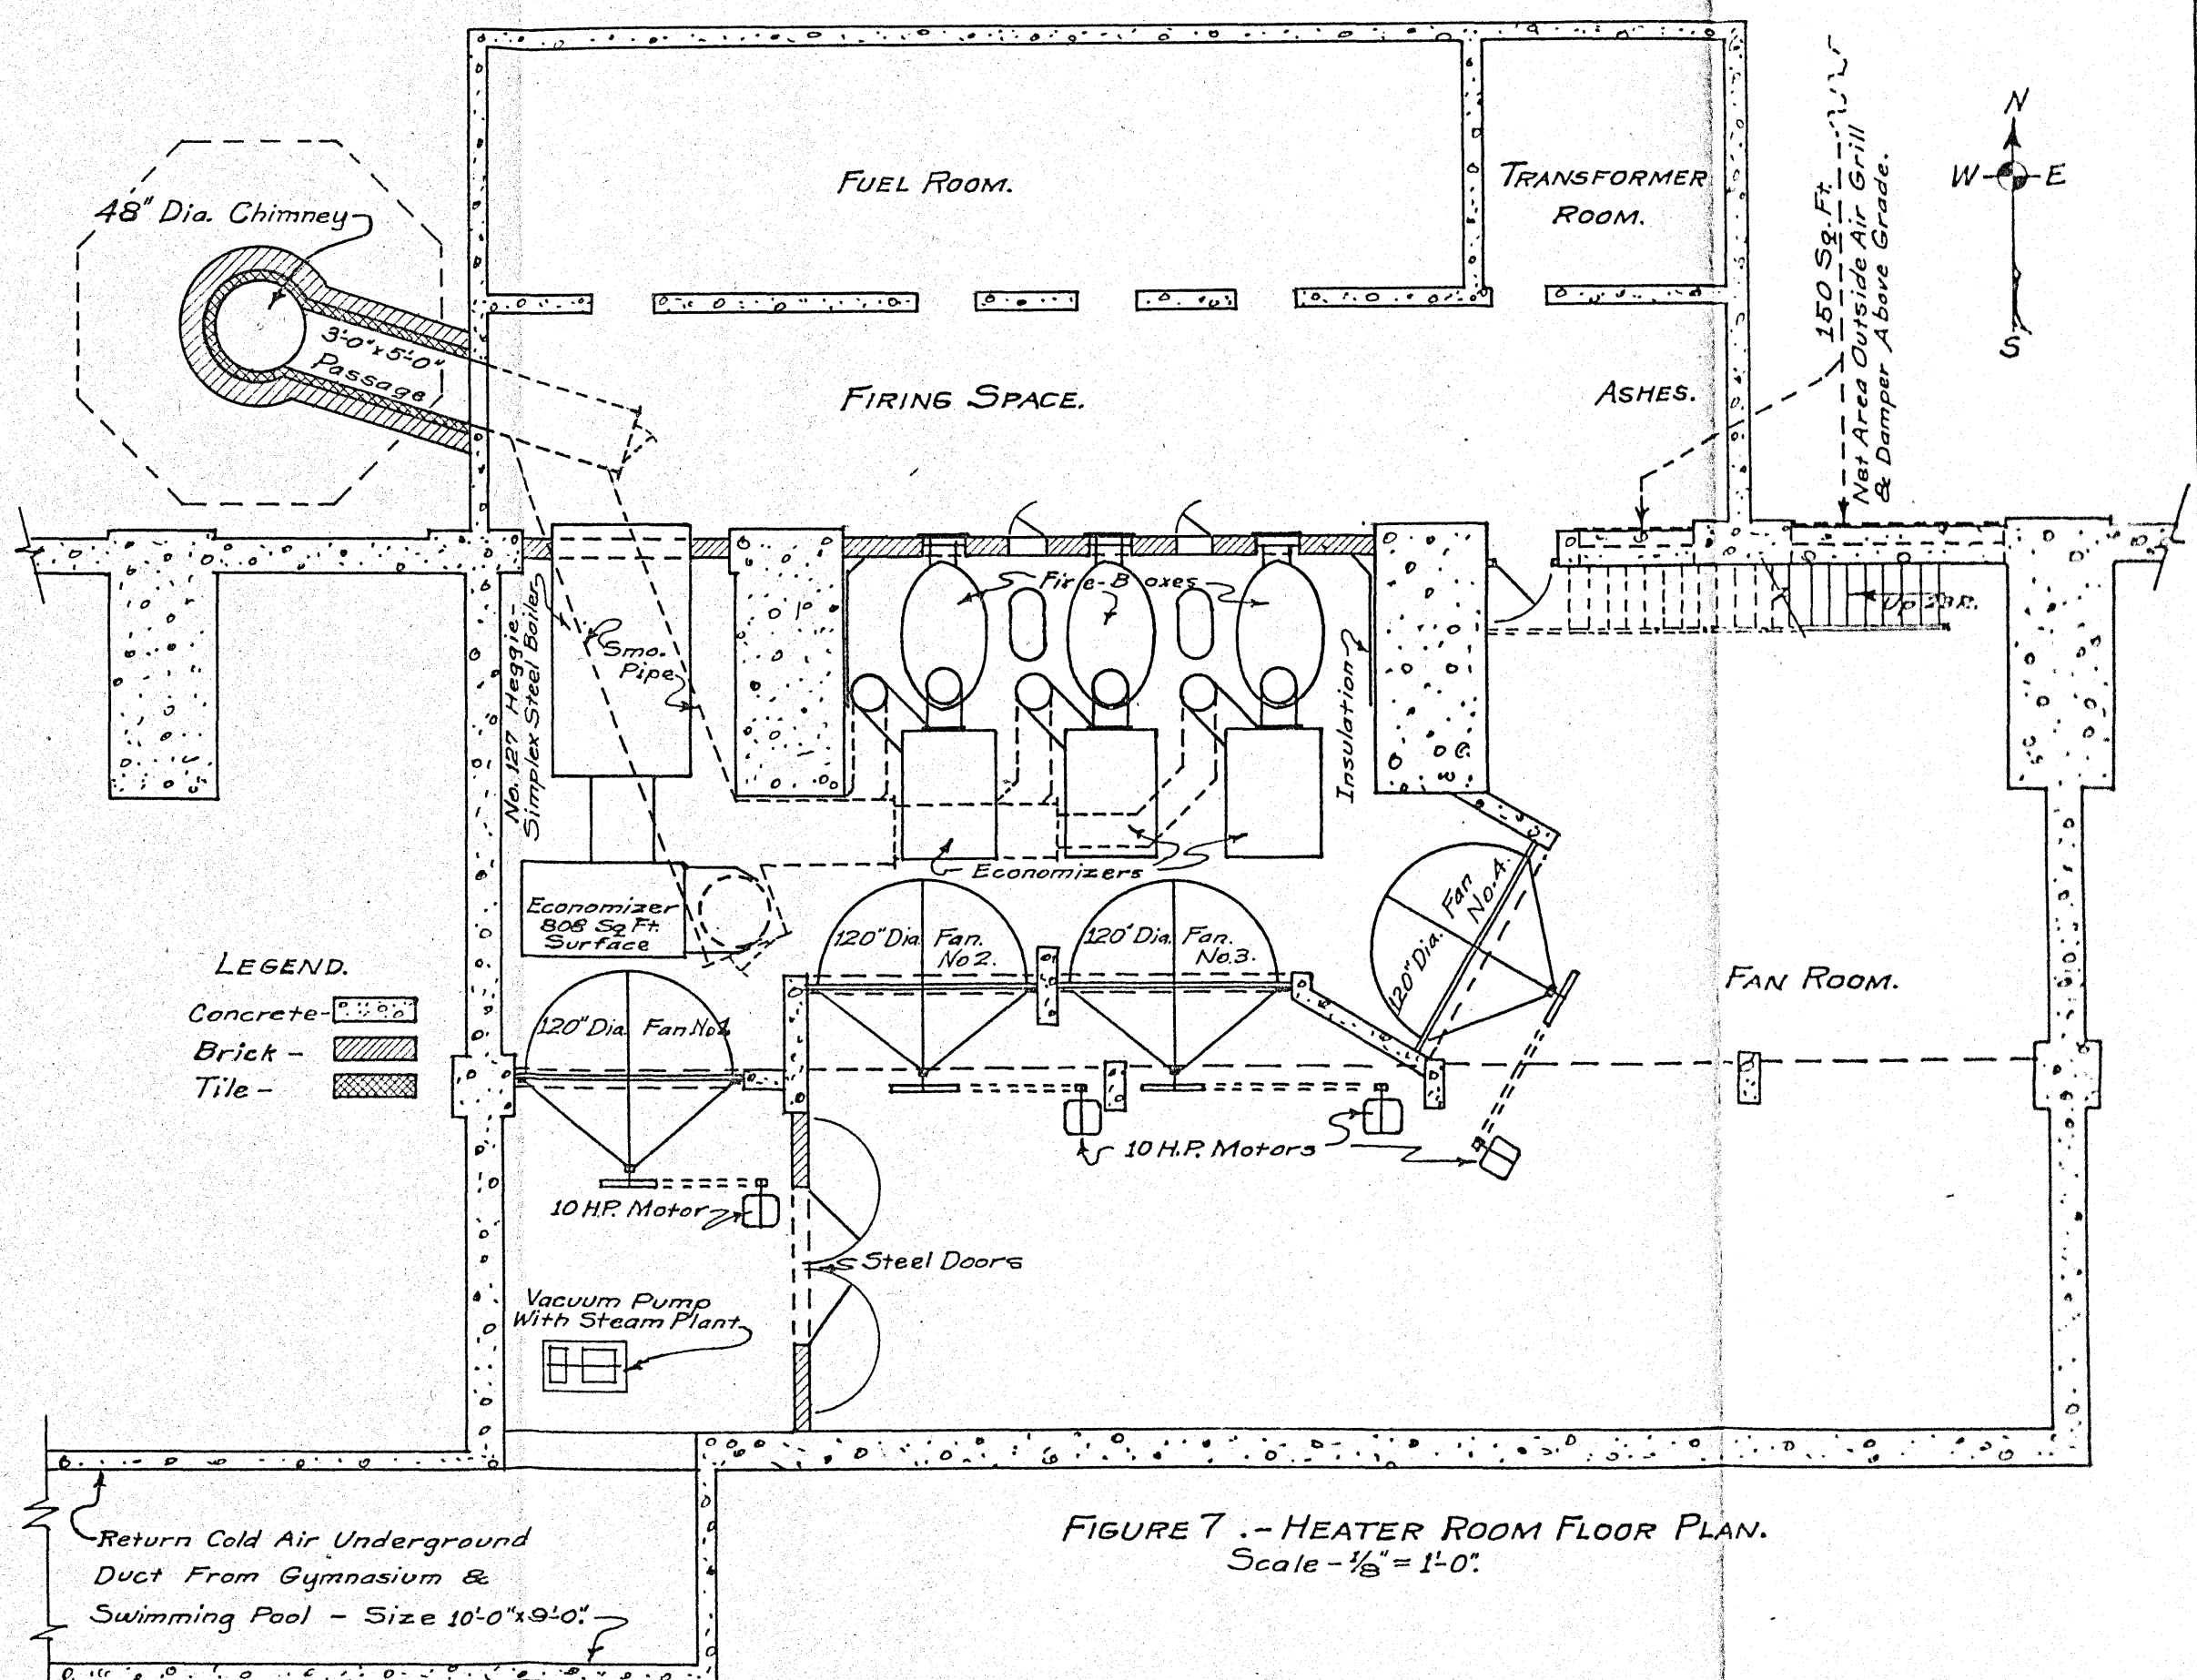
HEATER ROOM FLOOR PLAN.
